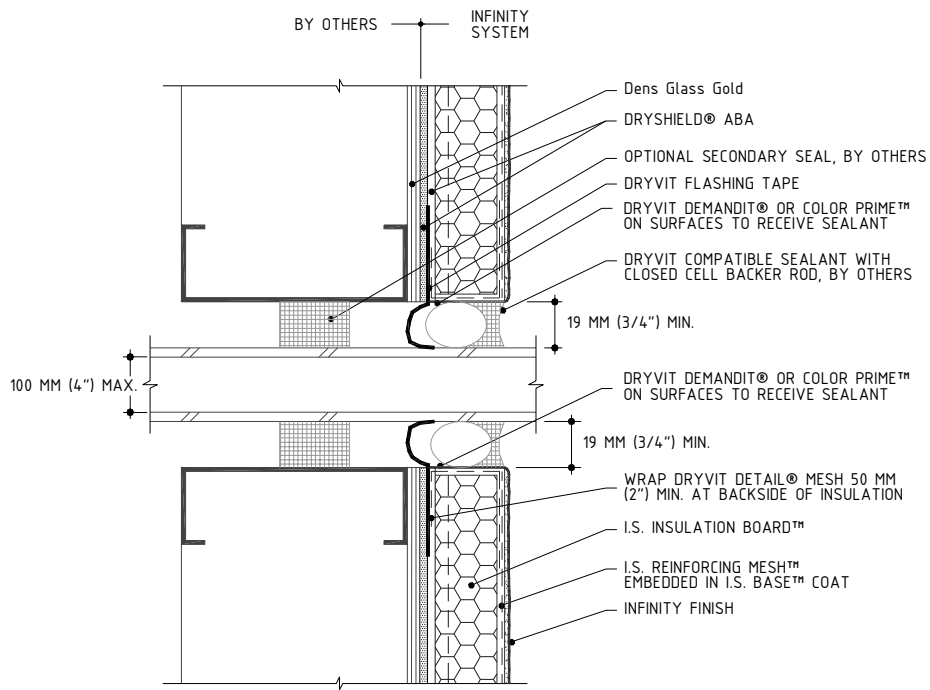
TYPICAL INSTALLATION DETAILS—(Continued)
